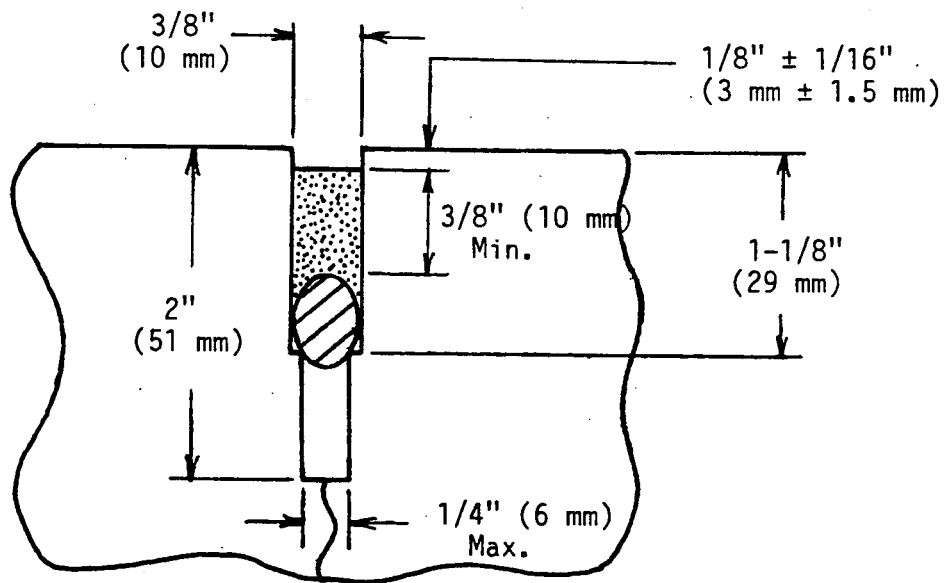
3/8-Inch (10 mm) Skewed Contraction Joint Detail
